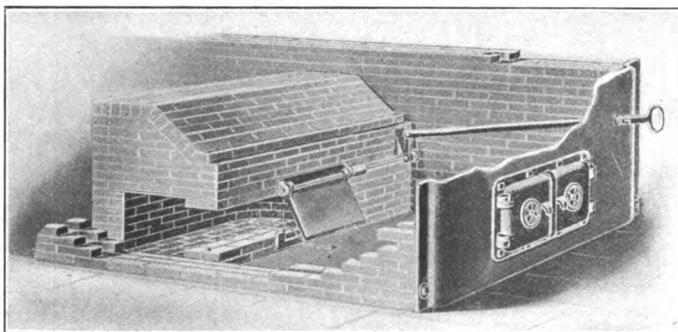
Air Duct Arranged to Introduce Air through Opening in Bridge Wall
